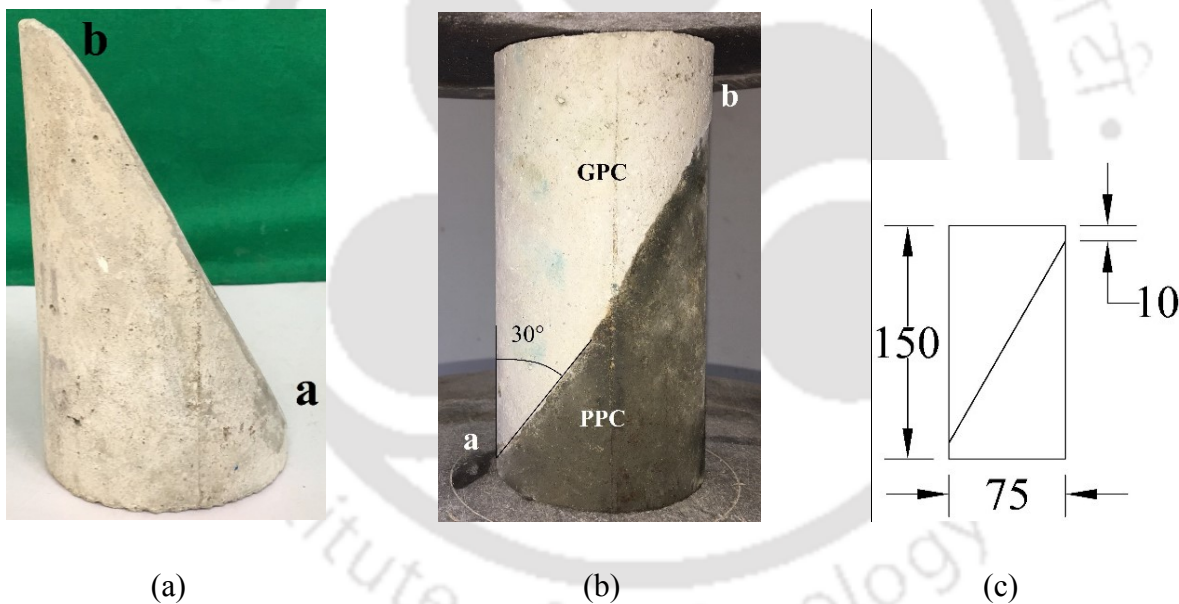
(a) PCC substrate for slant shear specimen, (b) slant shear specimen, (c) details of specimens for slant shear test (All dimensions are in mm).
